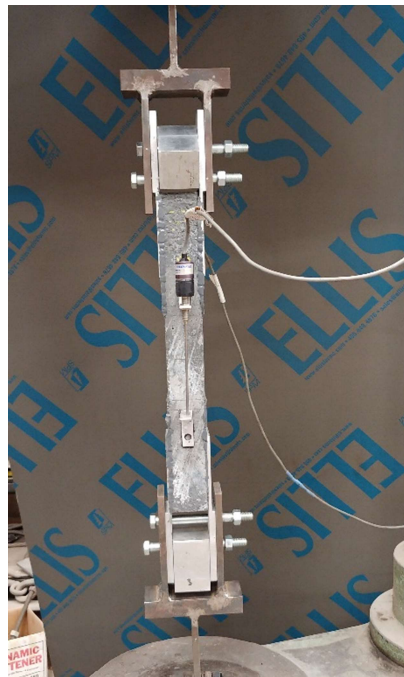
1 Direct tensile UHPC test assembly
